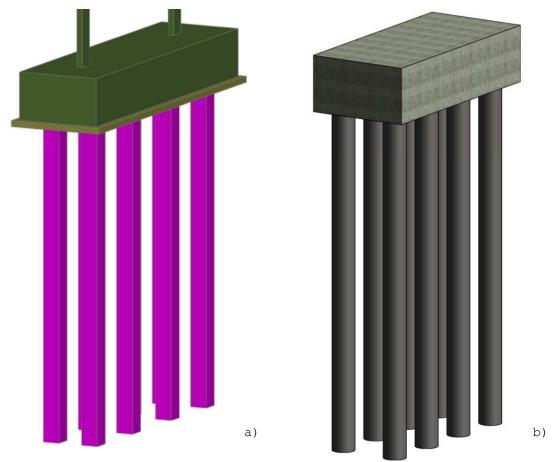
Example of a footing for a bridge in: a) a standard 3D AutoCAD 2007 draw and b) BIM model from REVIT 2014.
